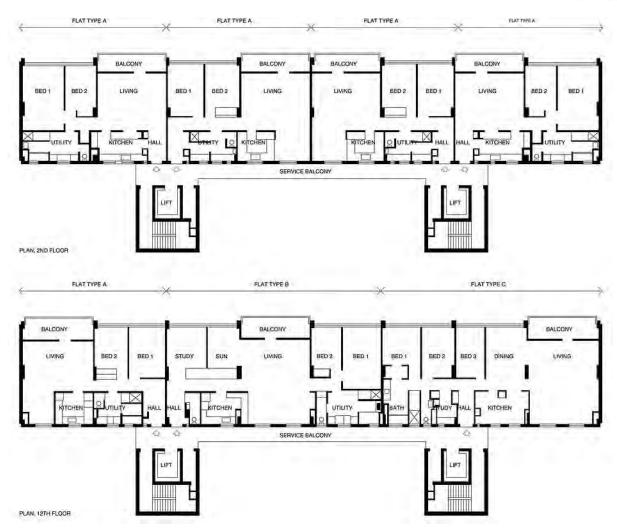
Plan of internal layout on the second and 12th floors, showing flat types A-C. (Source: Ben Brendan 2013 via Wikimedia Commons)
